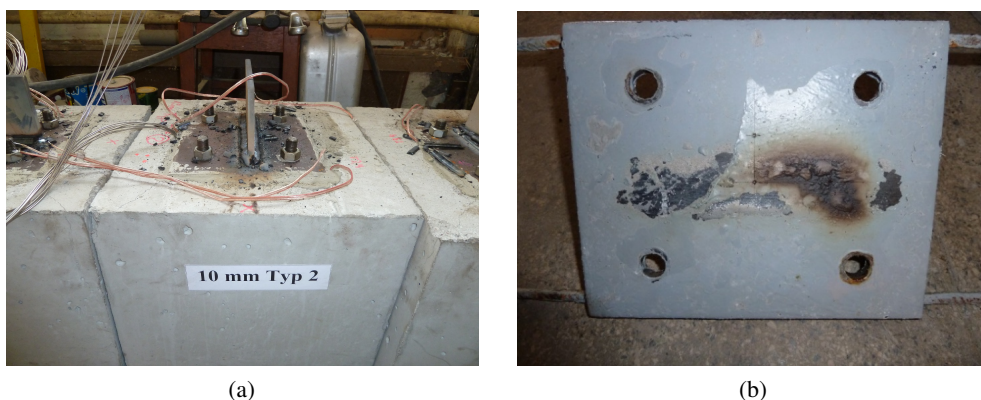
Damage to concrete and anti-corrosion coating of the anchor plate; (a) Cracks in concrete at the corners, (b) Damage to paint coating at the anchor plate
